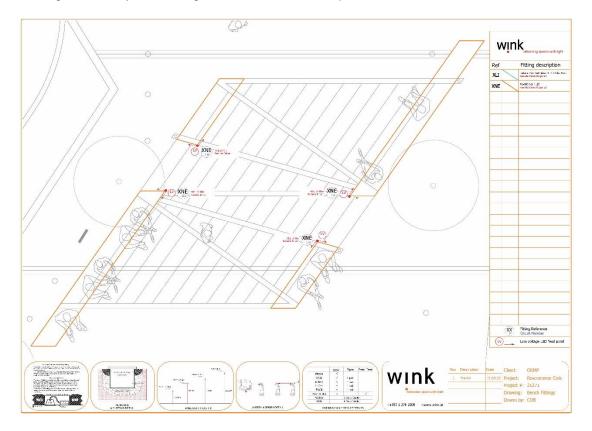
Uplighting of benches at Place Pey Berland, Bordeaux
